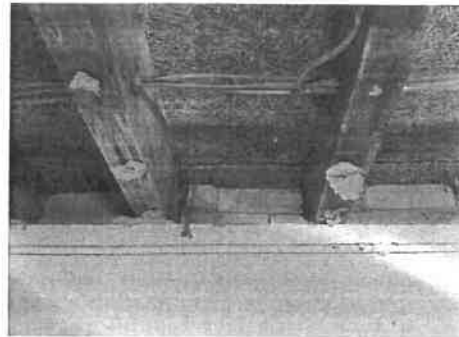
Wooden beams with concrete breeze blocks, plywood and electrical wiring exposed
